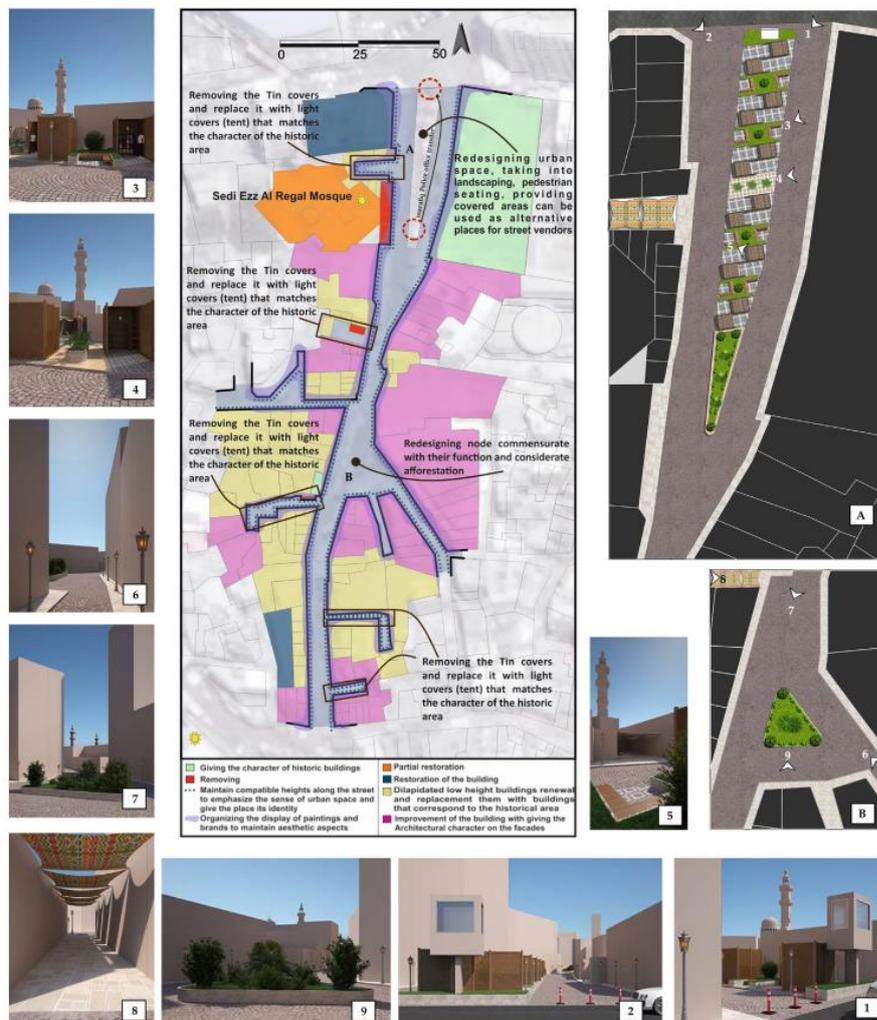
Proposed redevelopment of Al-Khan Street at the Historical center of Tanta City
